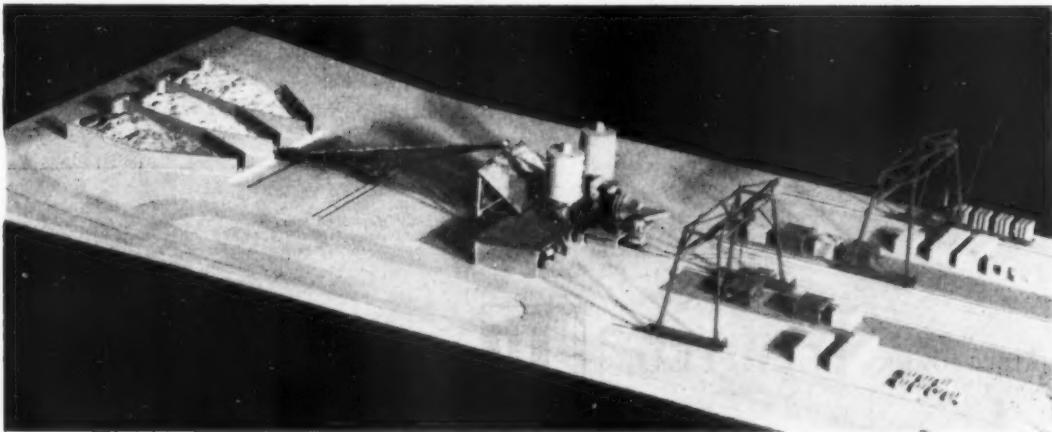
Photograph of model of plant for manufacturing large concrete units in Eastern Germany, using the stationary method.
